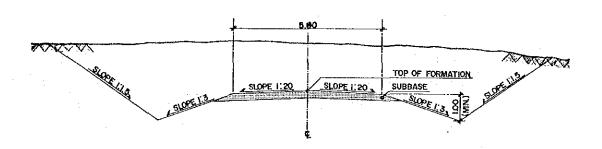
TYPICAL CROSS SECTION IN CUTTING (RAIL LINK)
